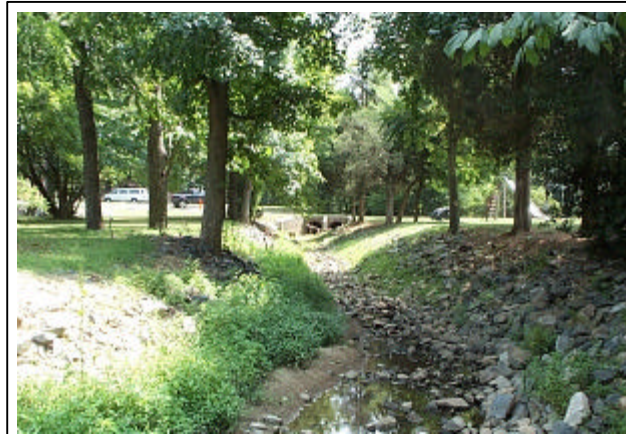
McMullen Creek – Looking downstream from Mountainbrook Road.
